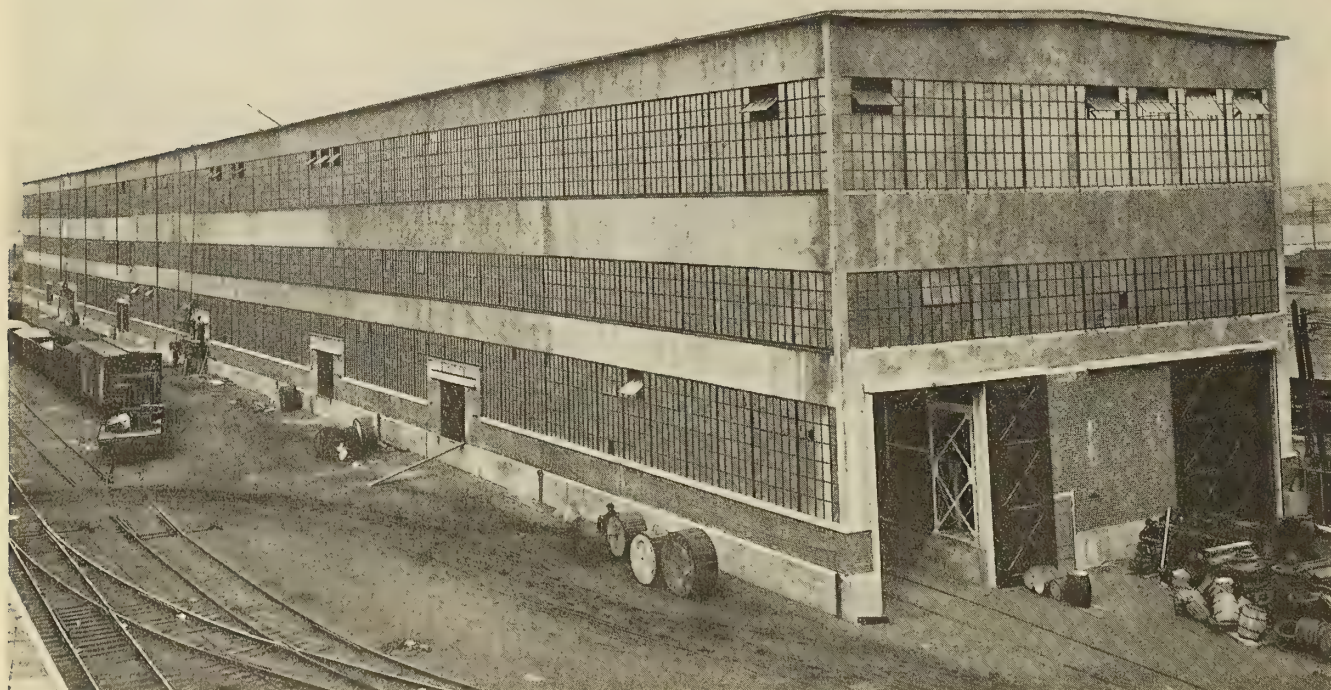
Application of Truscon Type Steel Windows to the Freight House of the New York Shipbuilding Corporation
